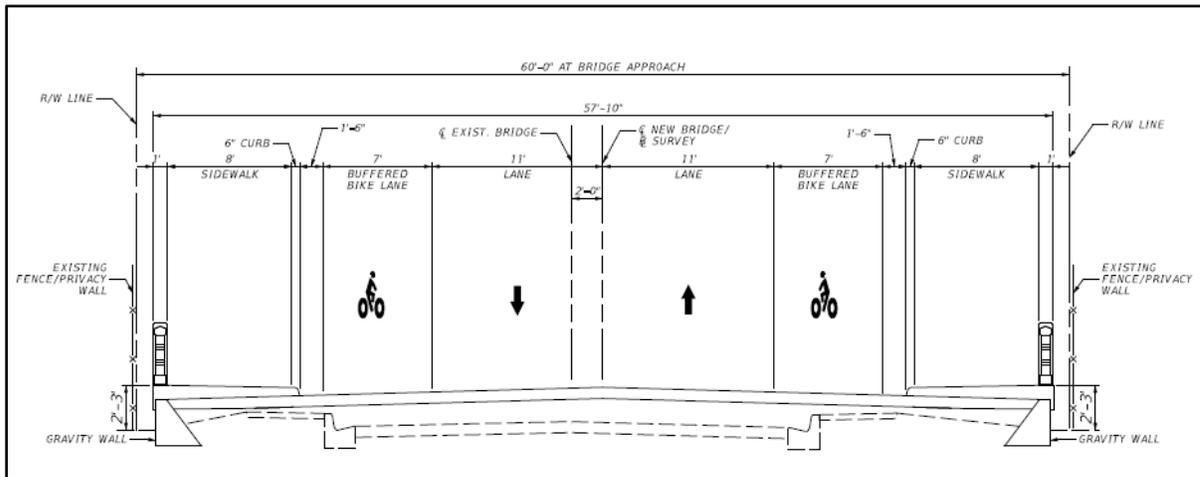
Replacement Alternative 7 – Raised Bridge Profile
